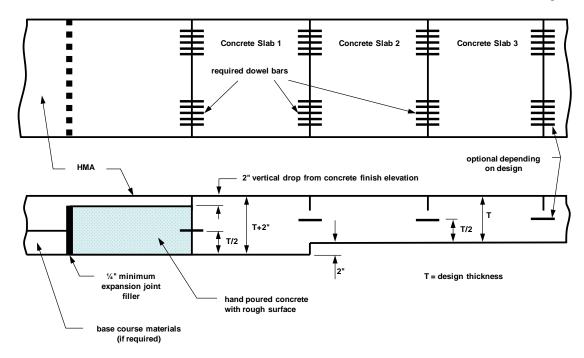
Detail of Asphalt and Concrete Slab Joint
